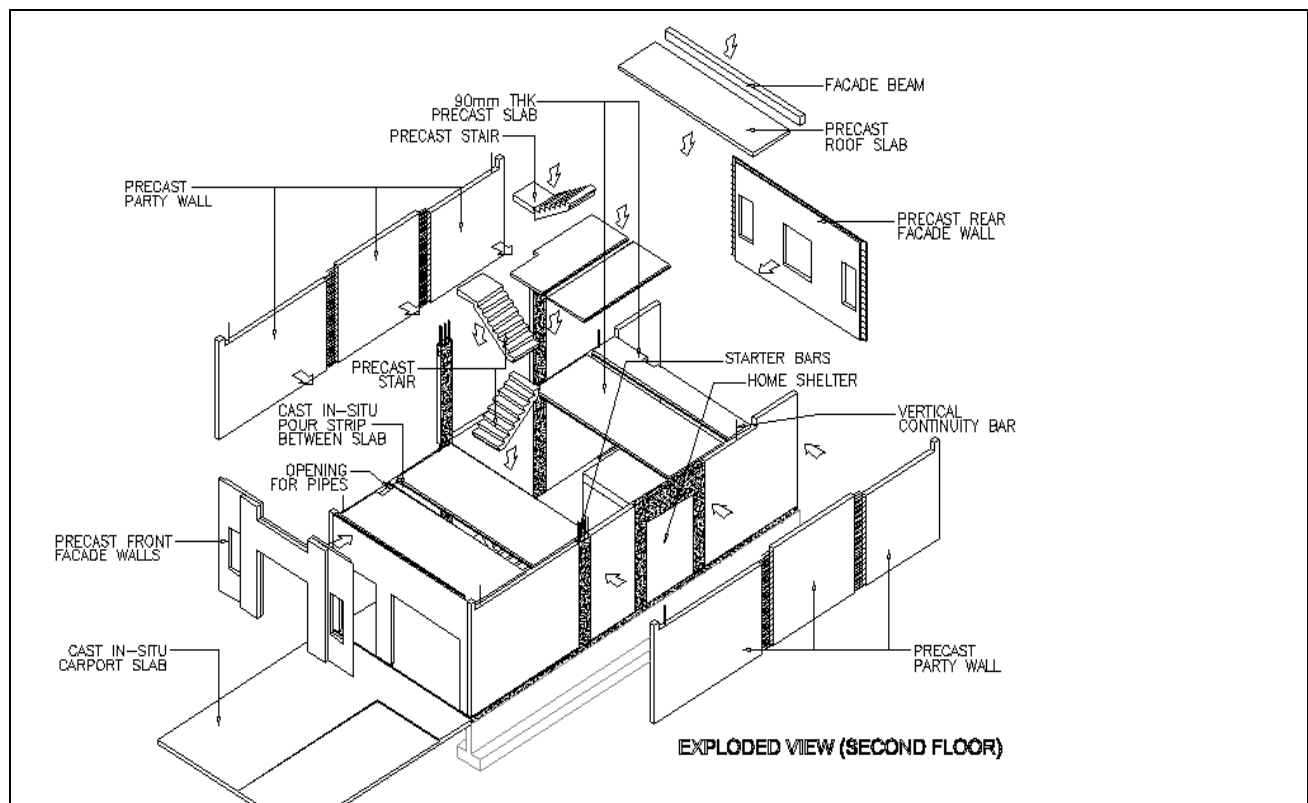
Precast prestressed slabs spanning between walls with composite in-situ topping for 2nd storey
